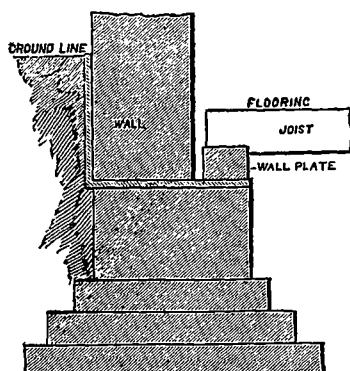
SHOWING VERTICAL DAMP COURSE ON WALL.
